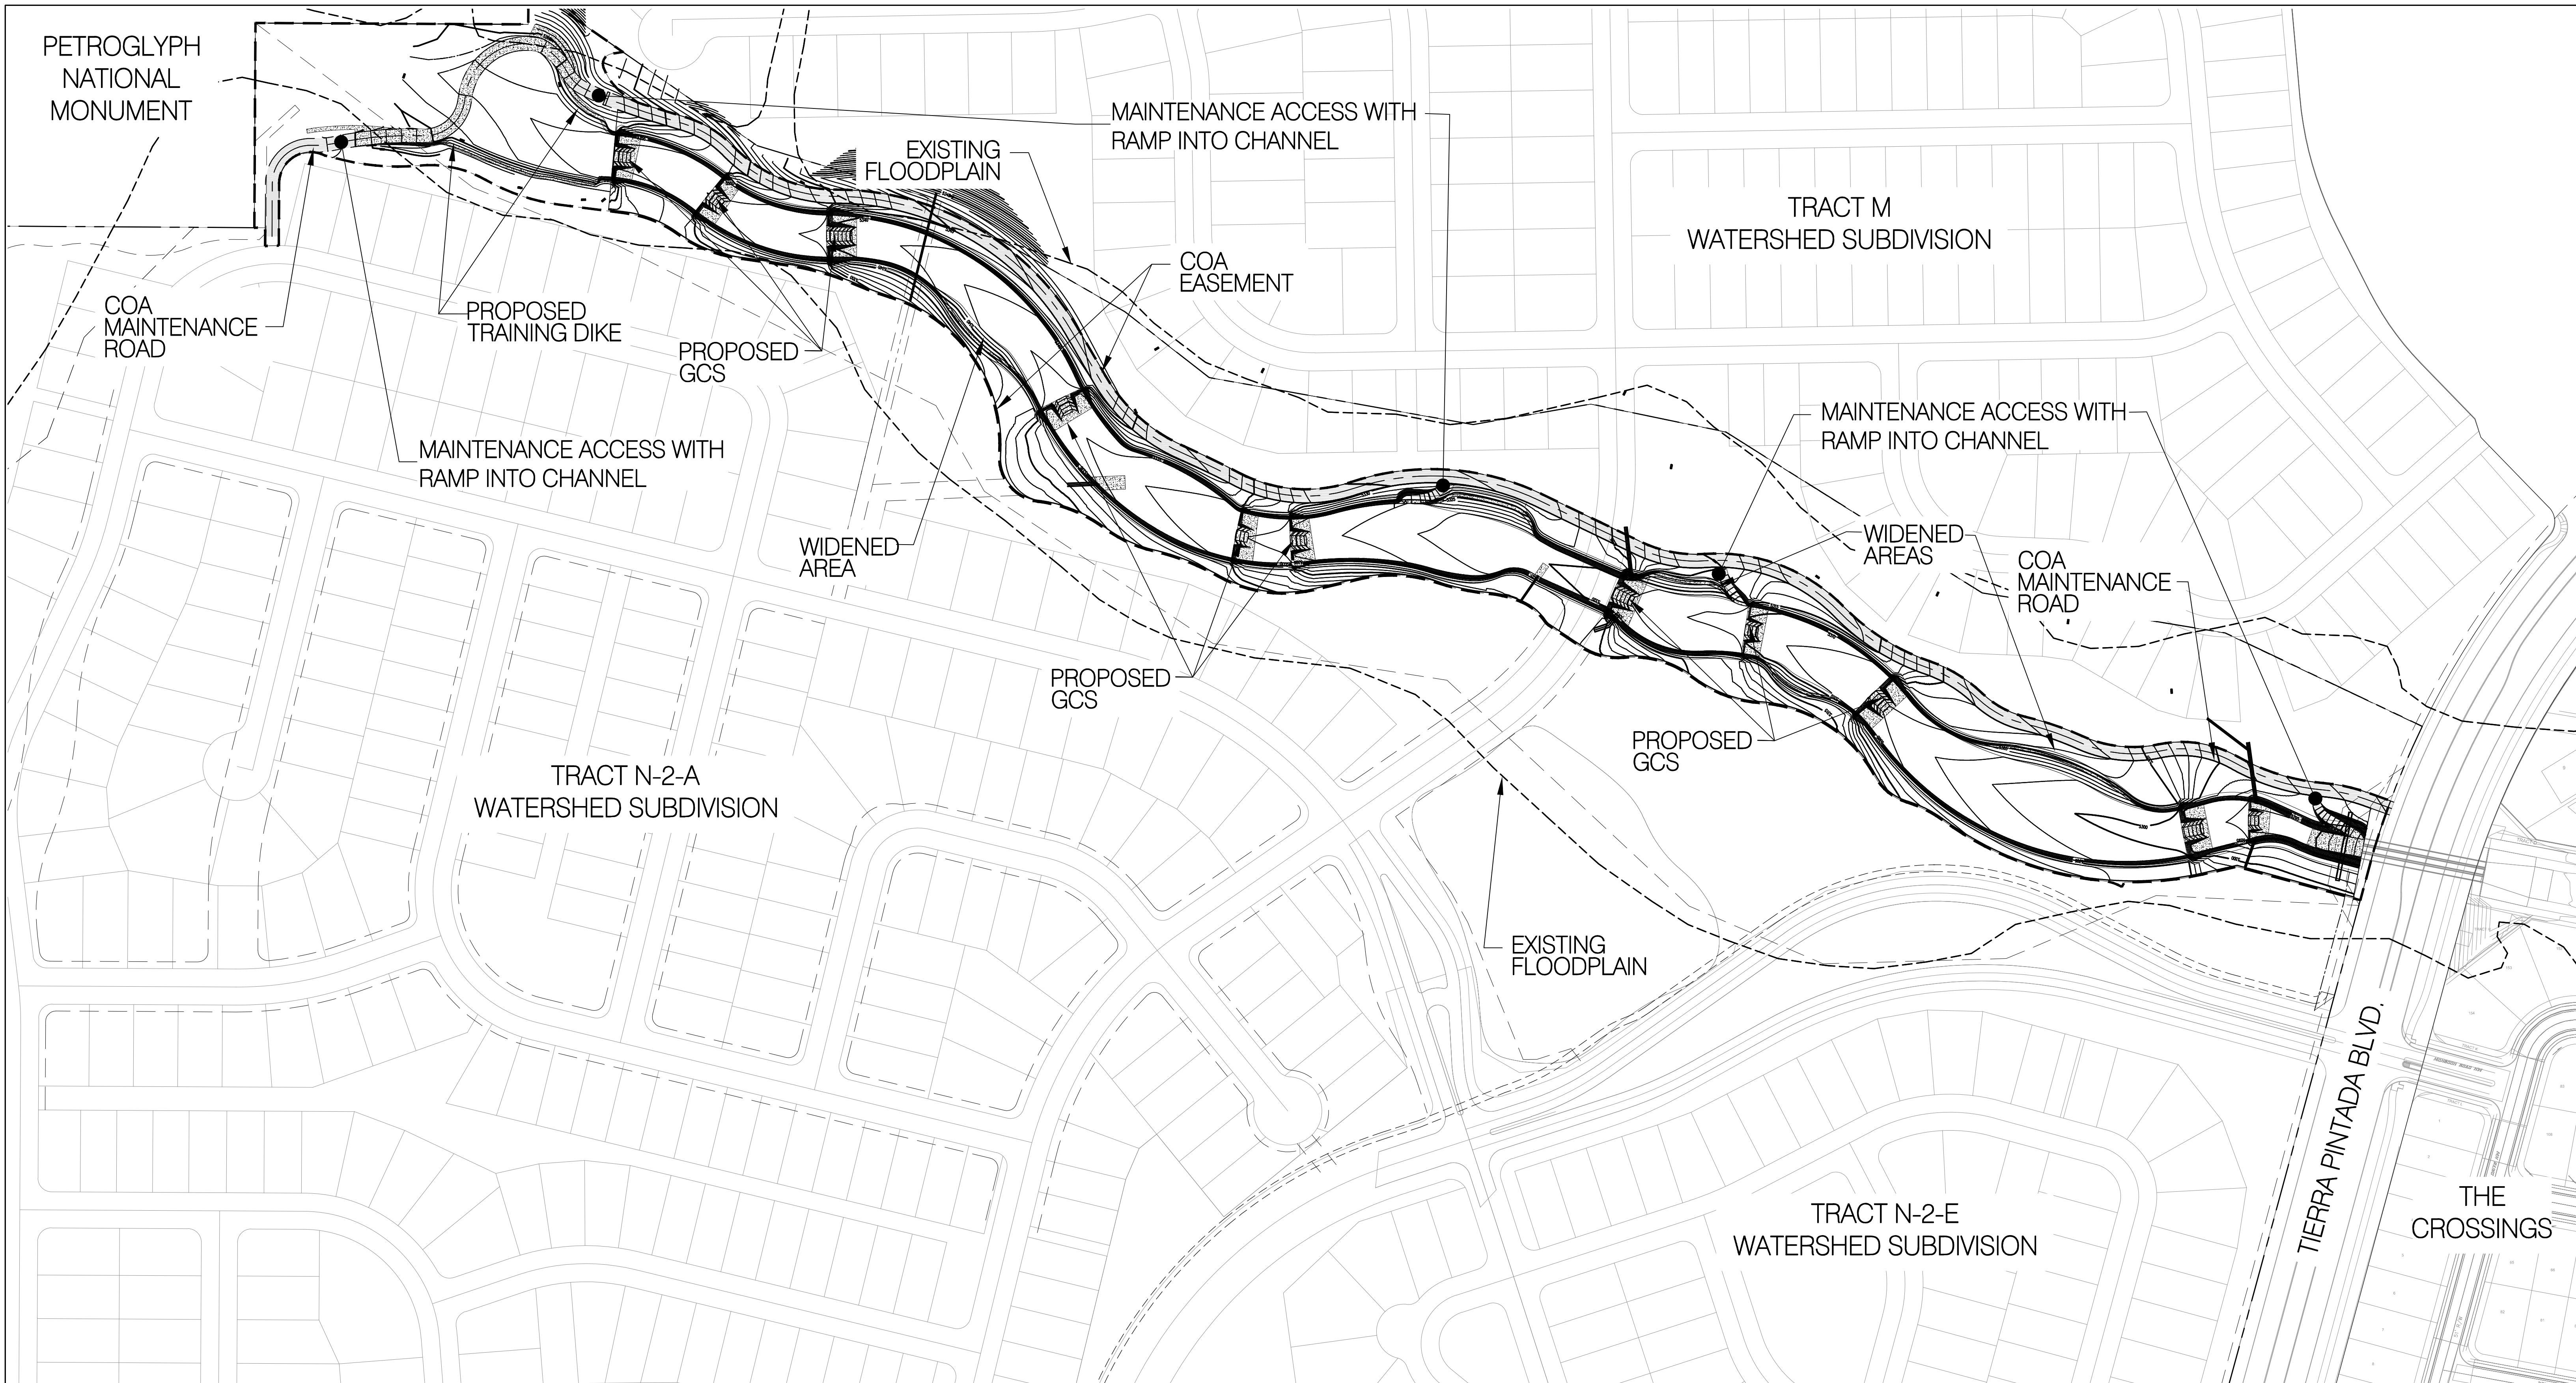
TYPICAL CHANNEL PLAN AND
